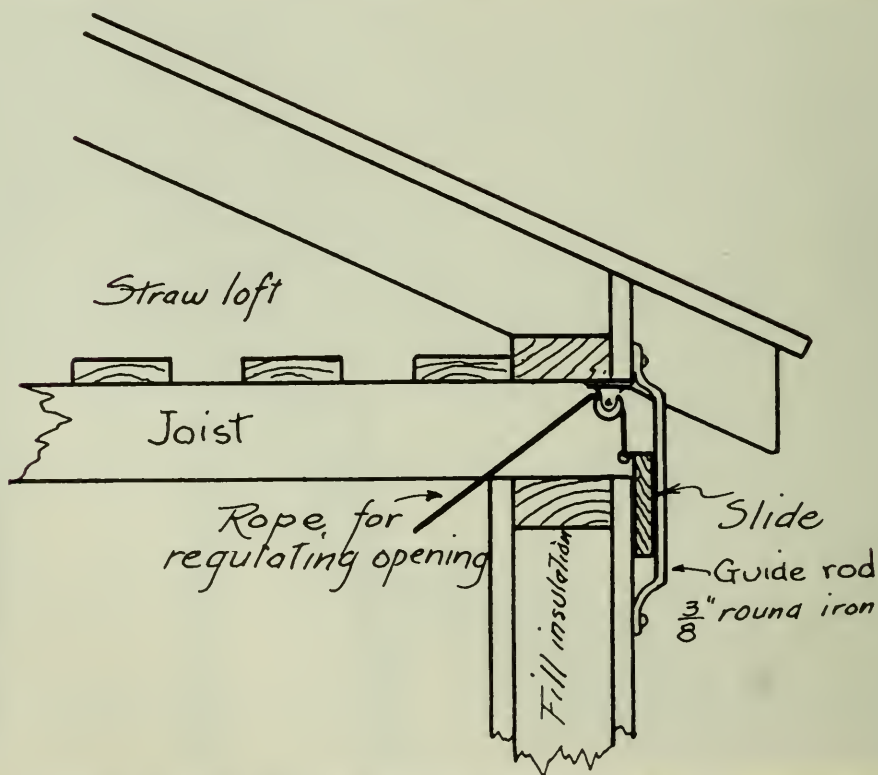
Detail of ventilator opening and shutter where the ceiling joists run from front to back of pen and joists are not sealed on the under side, as in the bottom storey of a two storey house.
